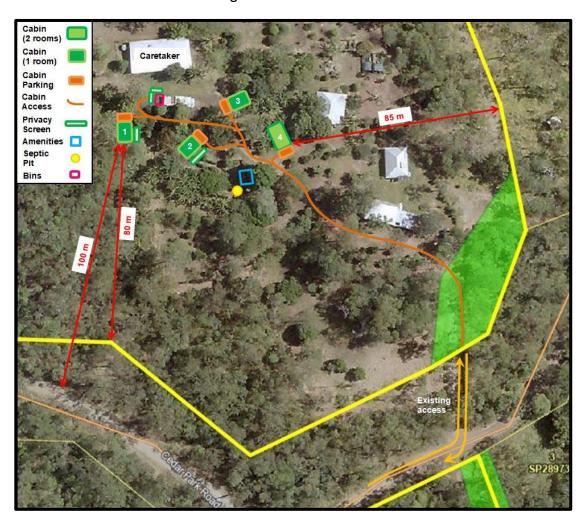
Proposed Nature Based Tourism Site Plan. (STP)
